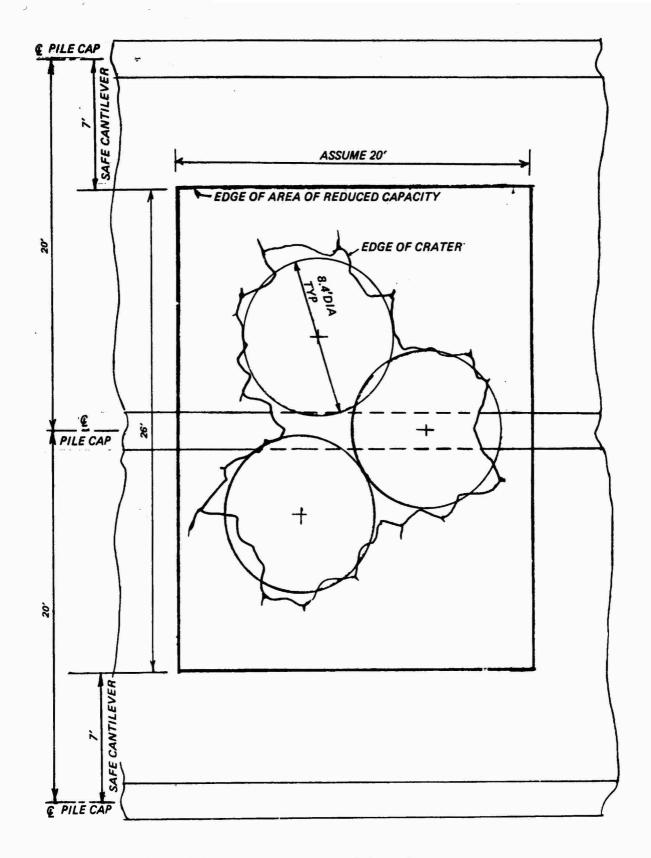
Configuration of Case 3 damage for the typical damaged berth
